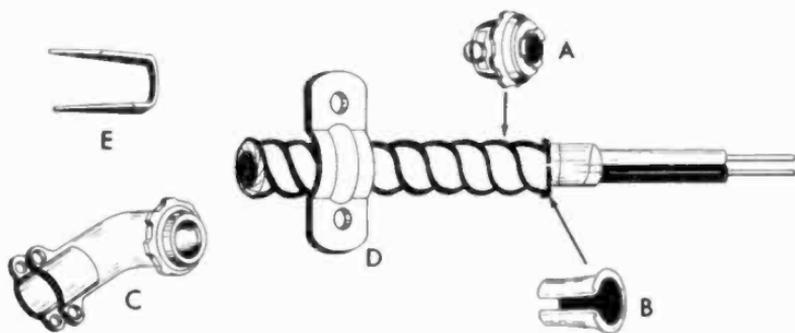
The coupler at *A* fastens flexible armored cable to knockout holes in junction and outlet boxes. Except for the screw on the side, used to hold the coupler to the cable, it fastens to the box in the same way as the thin-wall conduit. *B* must be fitted in between the outer armor and the insulating wrap just under it, before the coupler is slipped on. *C* is a right angle coupler for armored cable. Either the strap at *D* or the staple at *E* may be used to fasten the cable to rafters and joists.
